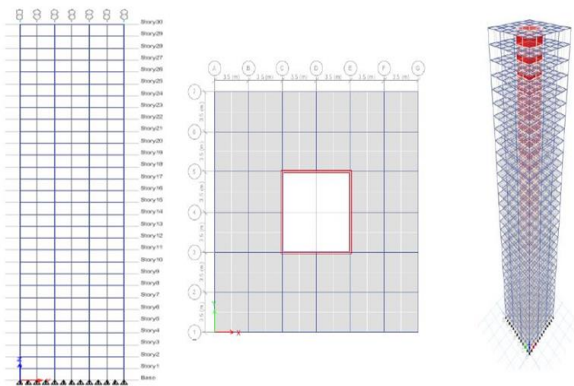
Elevation, Plan and 3-D View of 30-Storey Conventional Moment Resisting Frame
